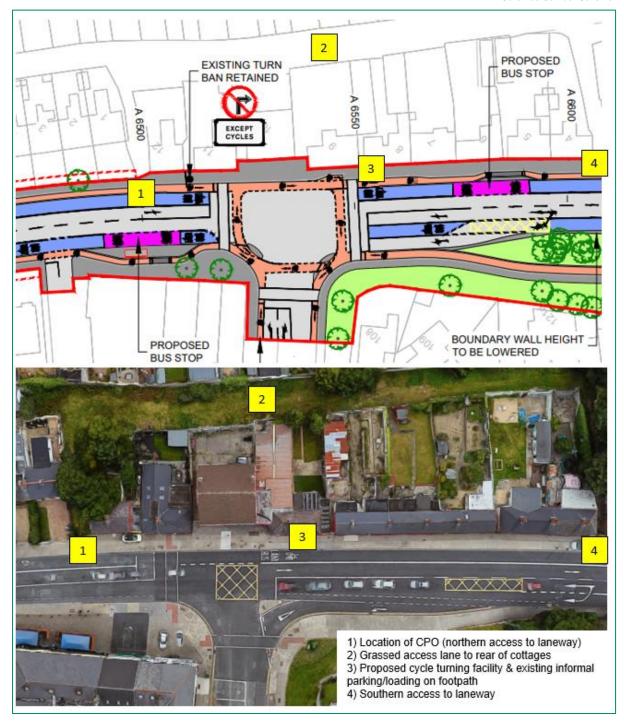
General Arrangement, Existing Layout and Key Features of Proposed Scheme at Artane Cottages Lower (Image Source: Google )
